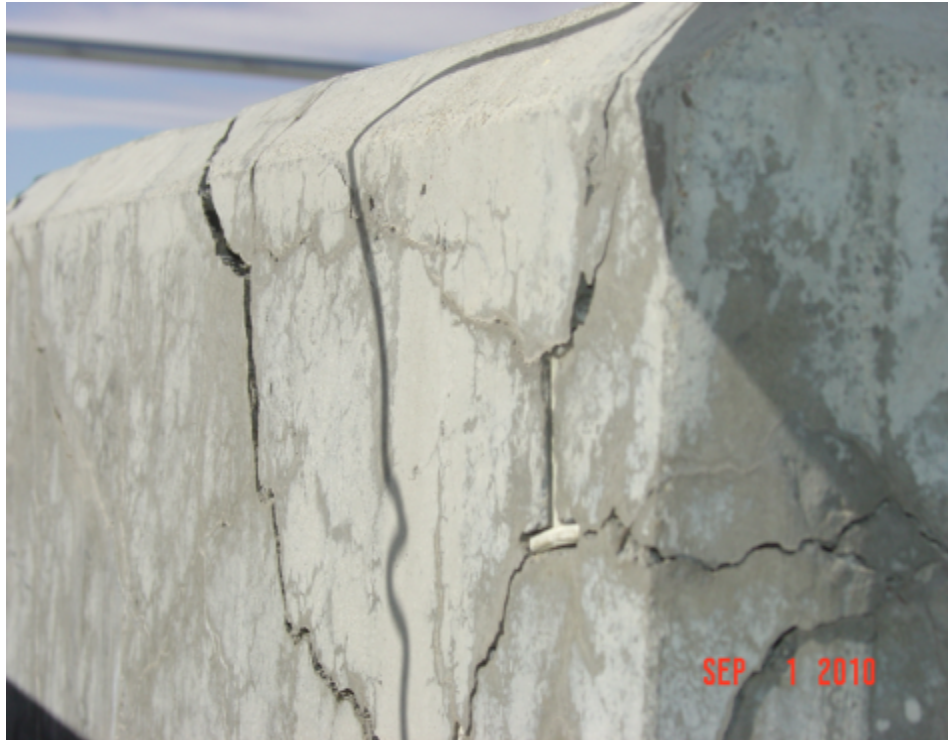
HSM 05 NE CORNER ROOF PRE REPAIR
